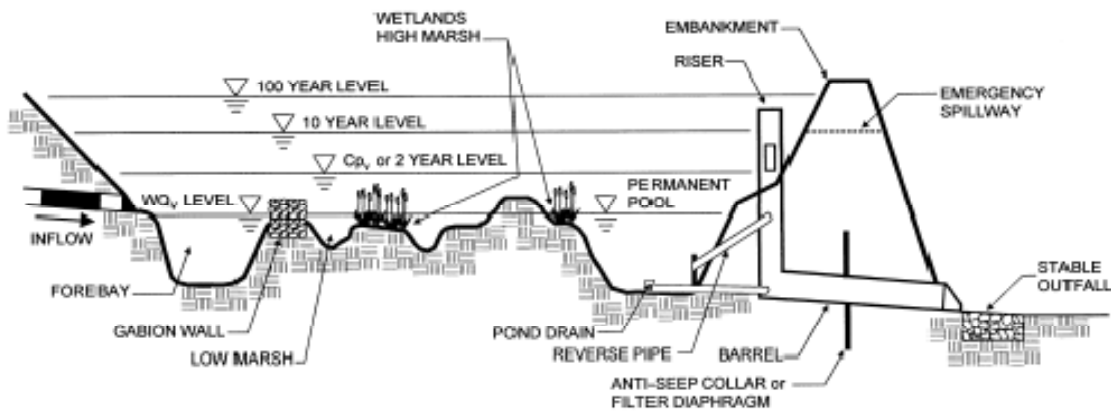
TYPICAL SHALLOW WETLAND, CROSS SECTION PROFILE (FROM MARYLAND STORMWATER DESIGN MANUAL, MDE 2009)
